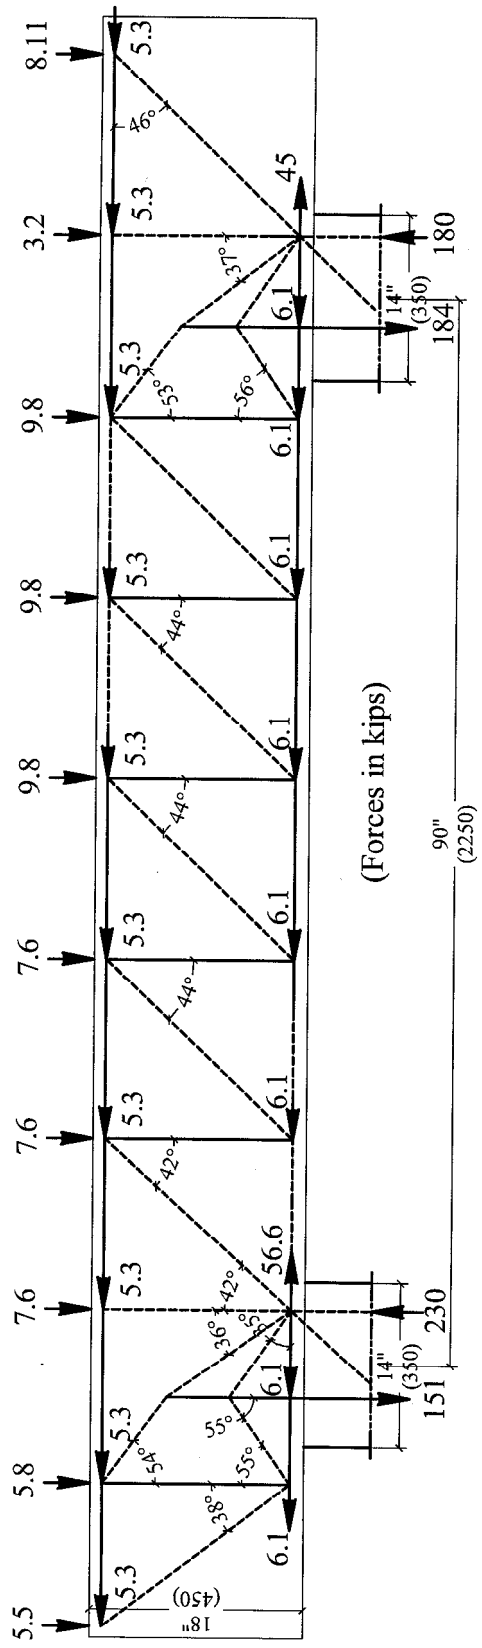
Strut-and-Tie Model in Short Specimen Beam
